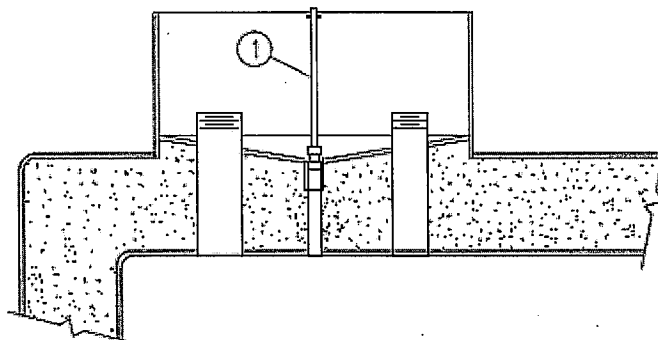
Typical "Product Side" Assembly Drawing for SuperVault AST with Integral Spill Container with Drain Plug
